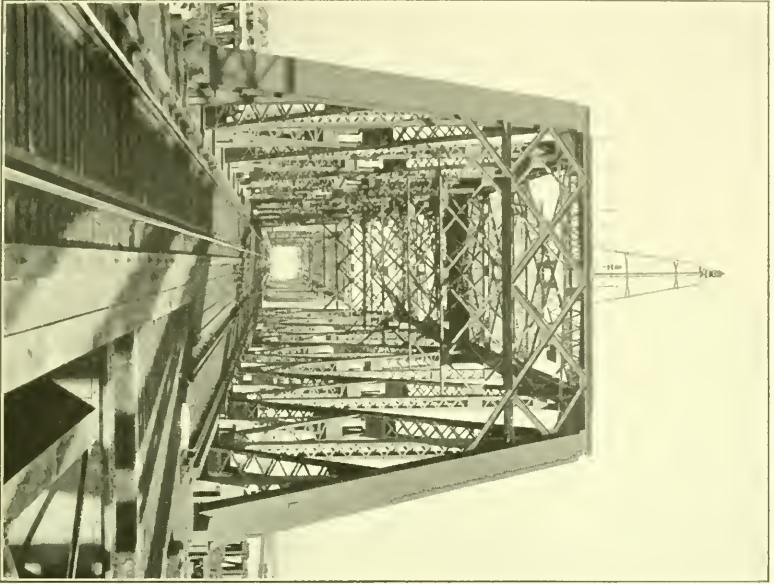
DUMBARTON POINT DRAWSPAN.
